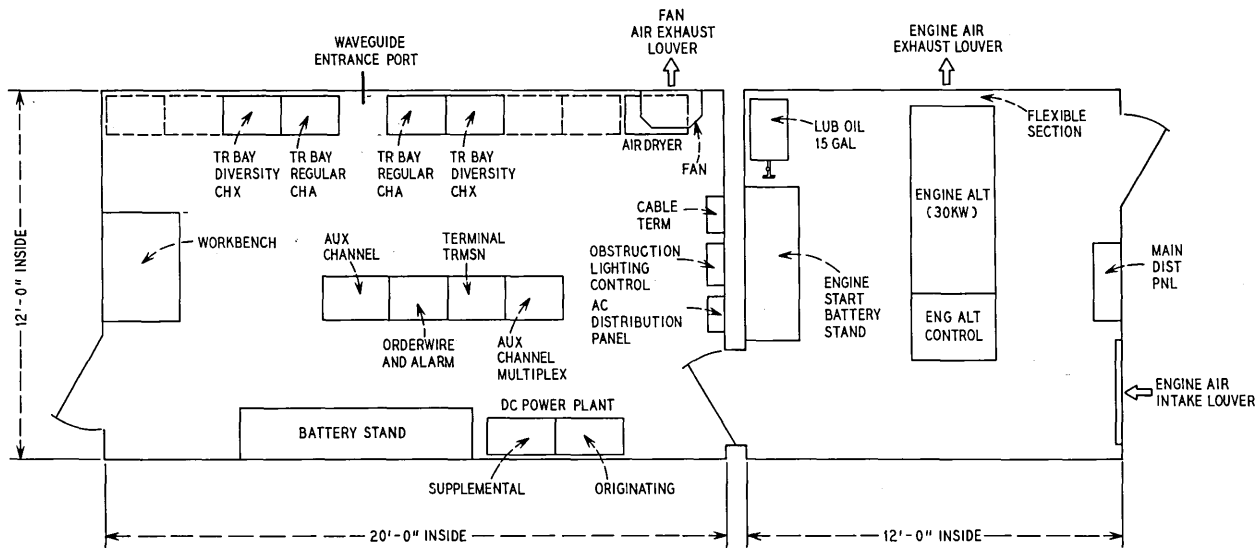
Standard floor plan layout for a TH-3 repeater station in a small building.
